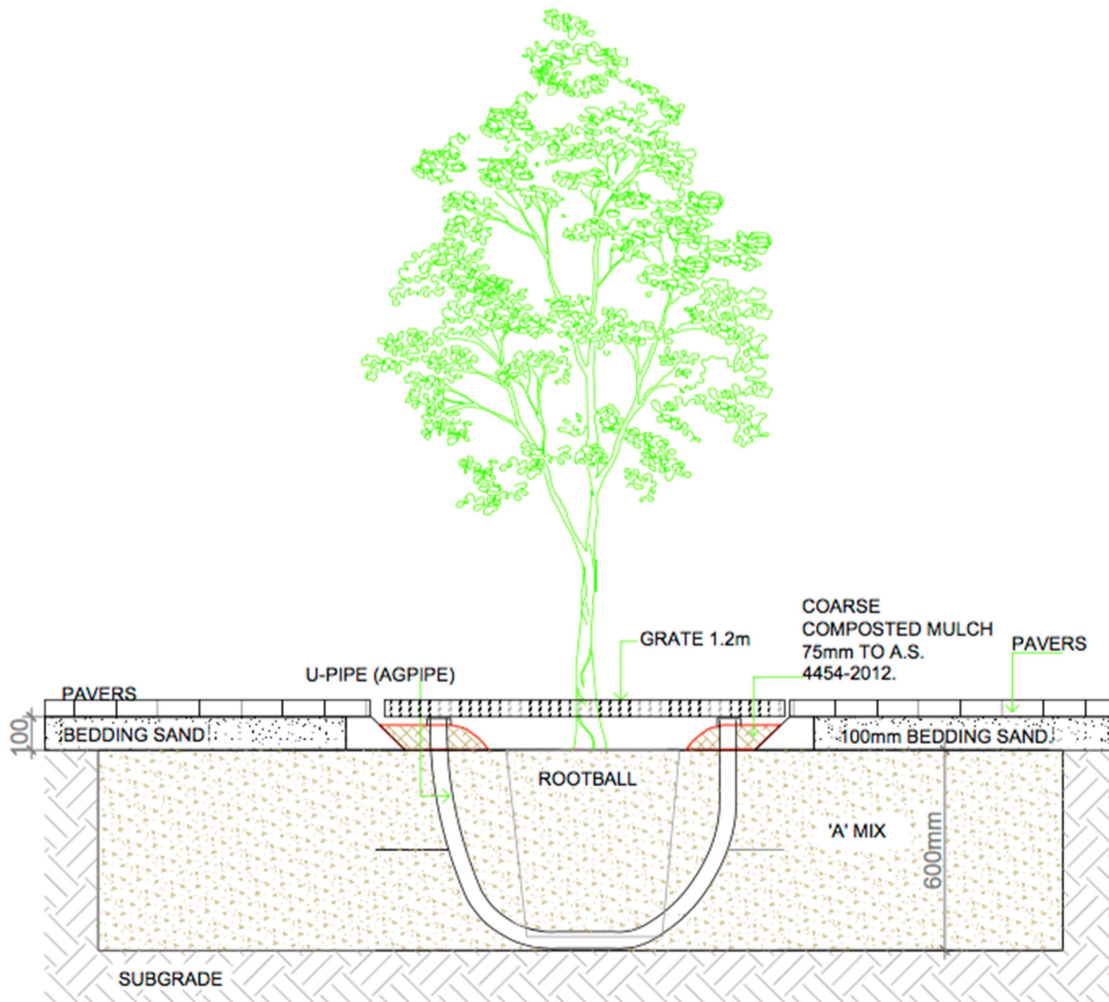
Typical cross section: Restricted space good drainage option (2 layers). Refer to Council's standard drawings for design detail.
